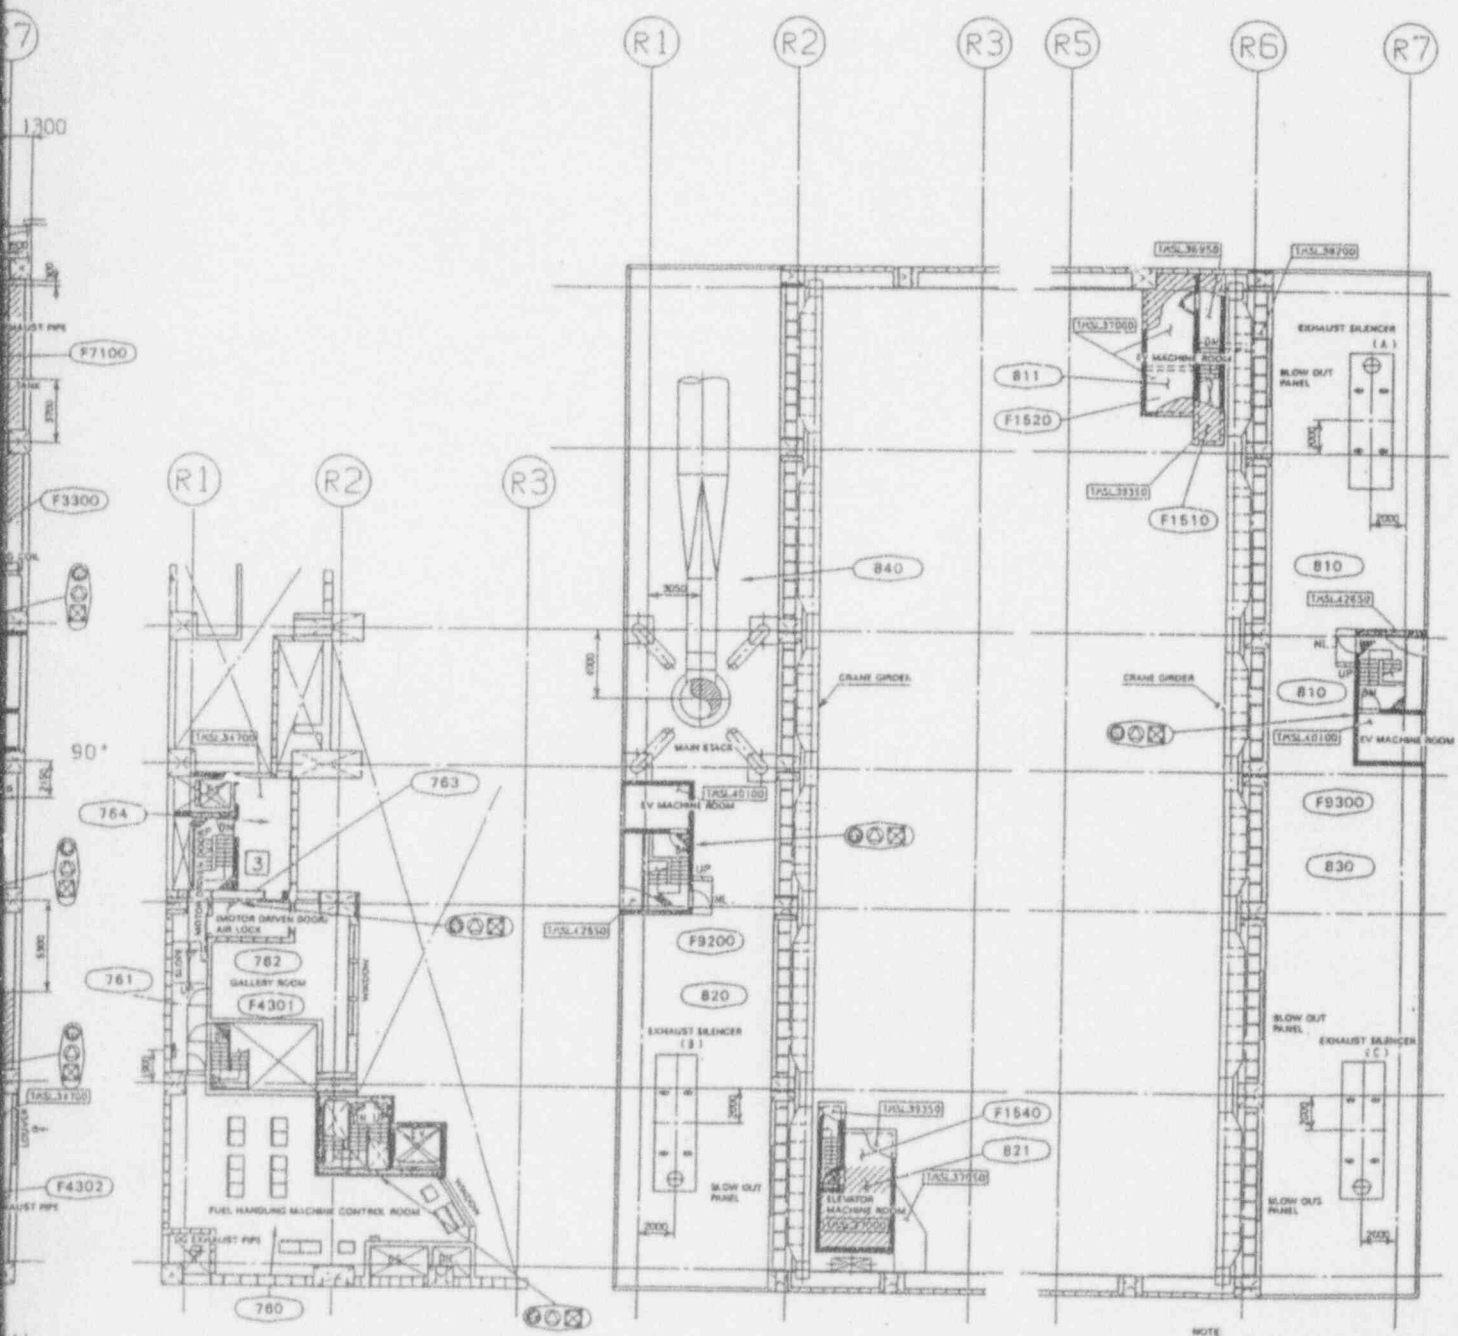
A.4-4 REACTOR BUILDING FIRE PROTECTION AT ELEVATION 12,300mm
